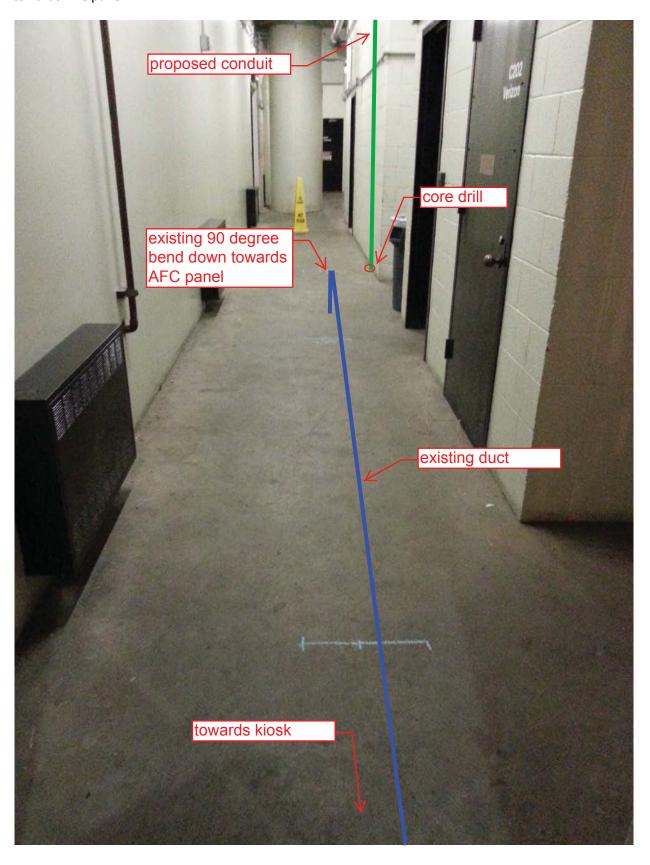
C13 King Street South: Existing duct and proposed conduit towards AFC panel on lower level
